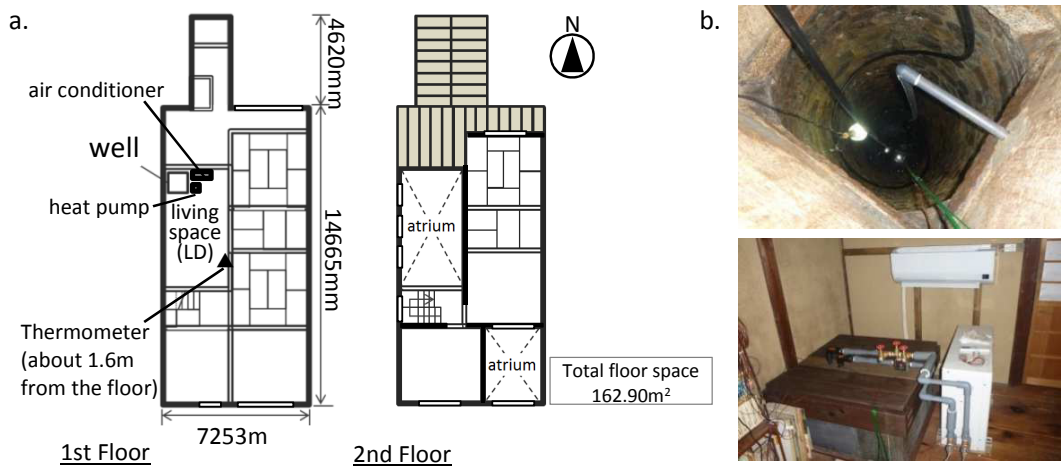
Surveyed Kyo-machiya: (a) floor plan of the dwelling; (b) images of the well with the heat pump installed.
